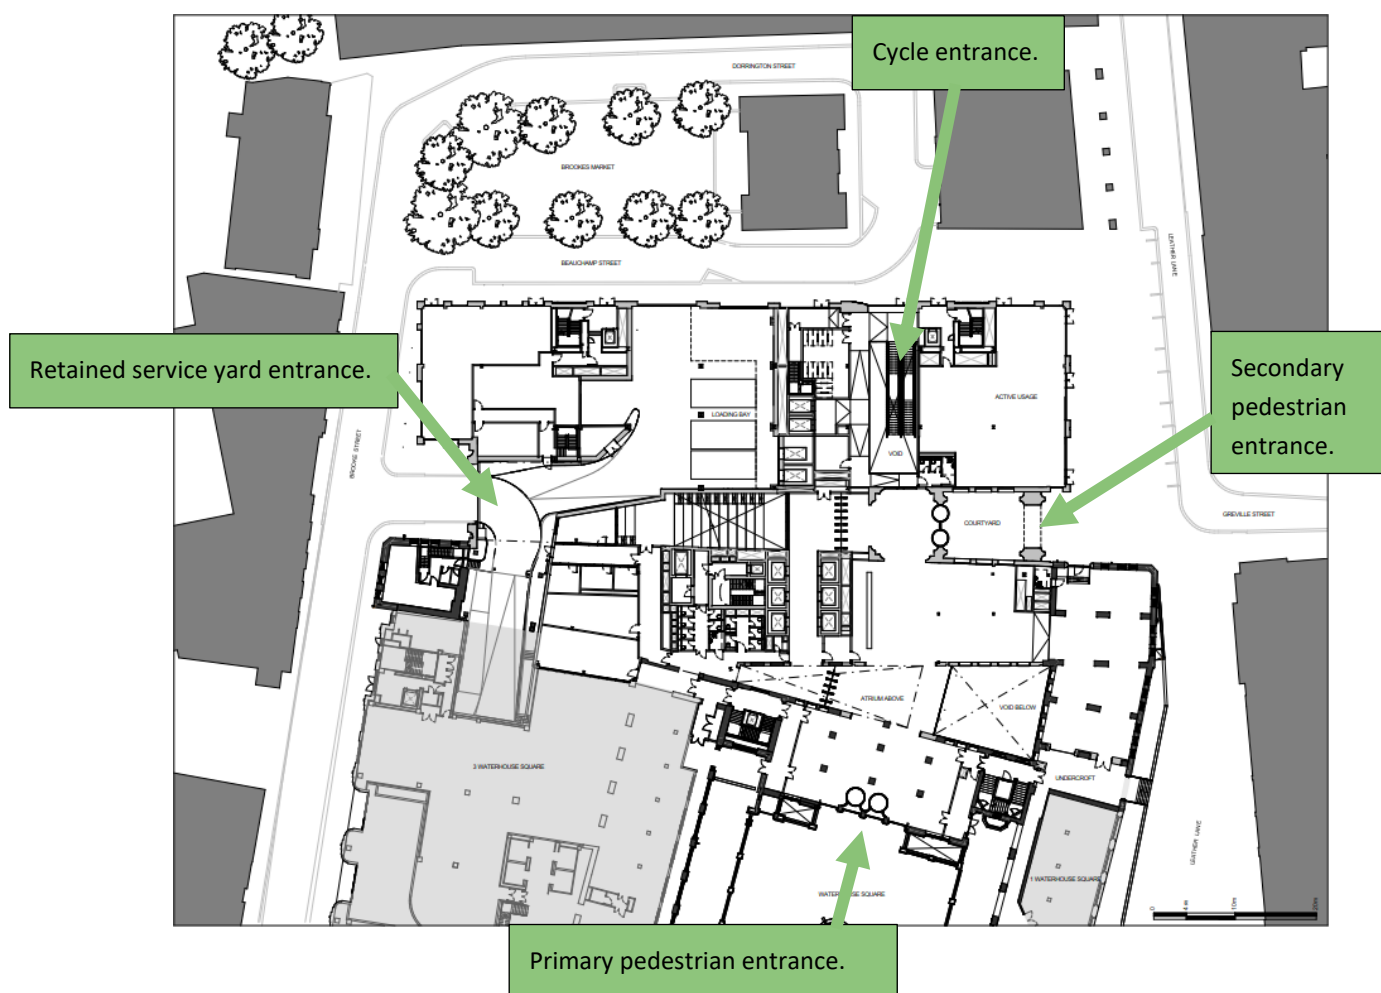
Proposed Development Lower Ground Floor Plan – Cycle Parking
